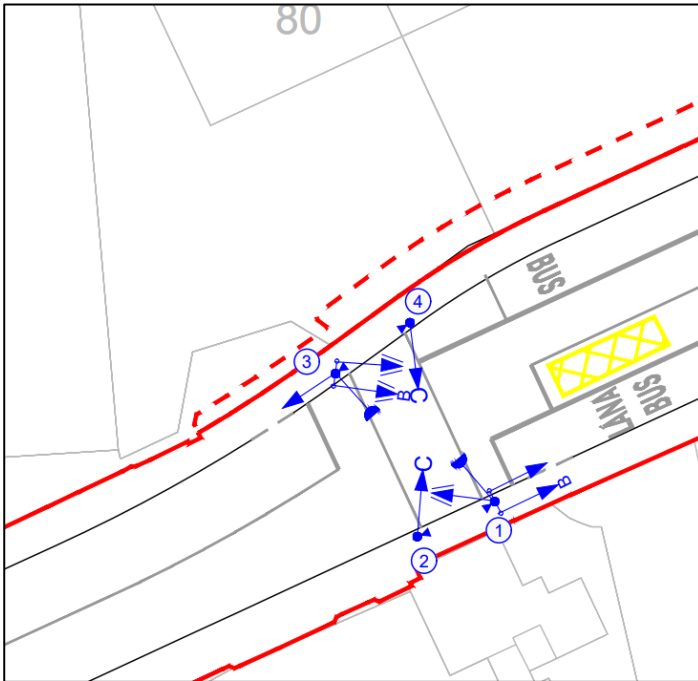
Traffic signal arrangement extracted from Junction System Design
